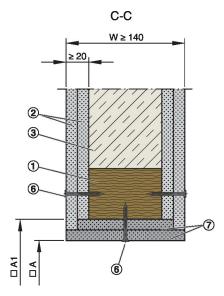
Lightweight partition wall, half-timbered construction with cladding on both sides
